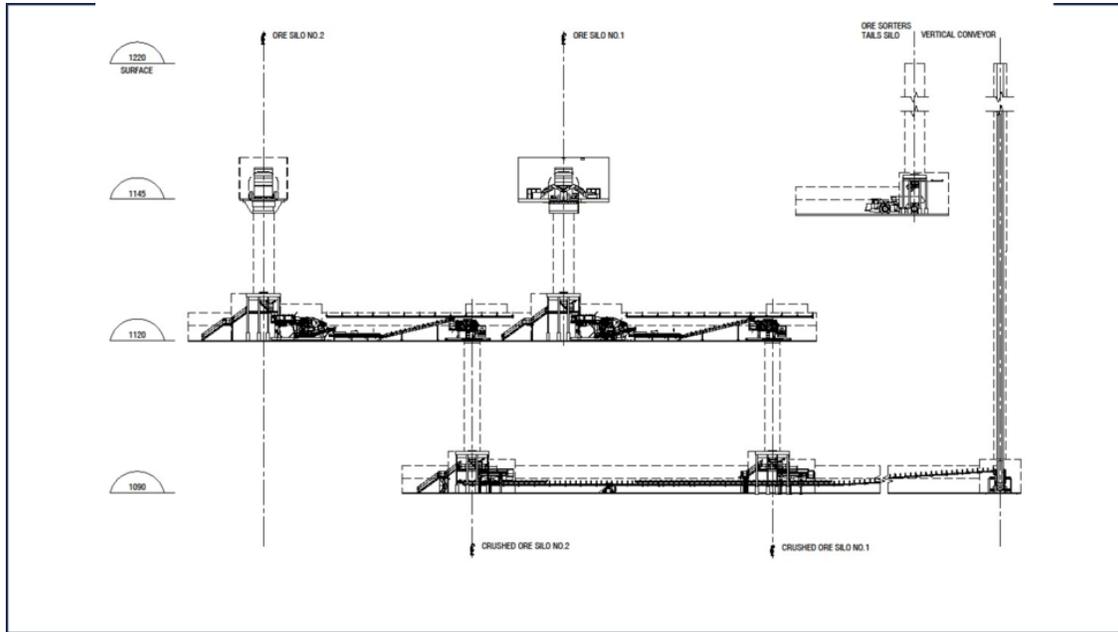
Elevation view of the U/G mineralized material and waste handling
